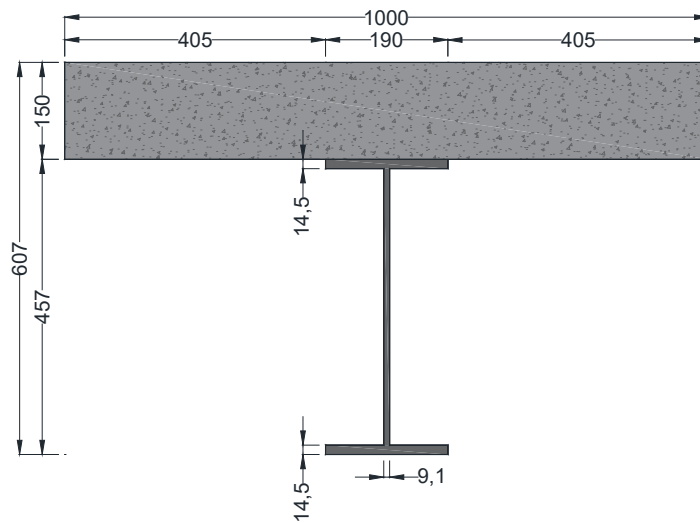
The geometrical characteristics of steel-concrete composite beam cross-section (length in mm)
